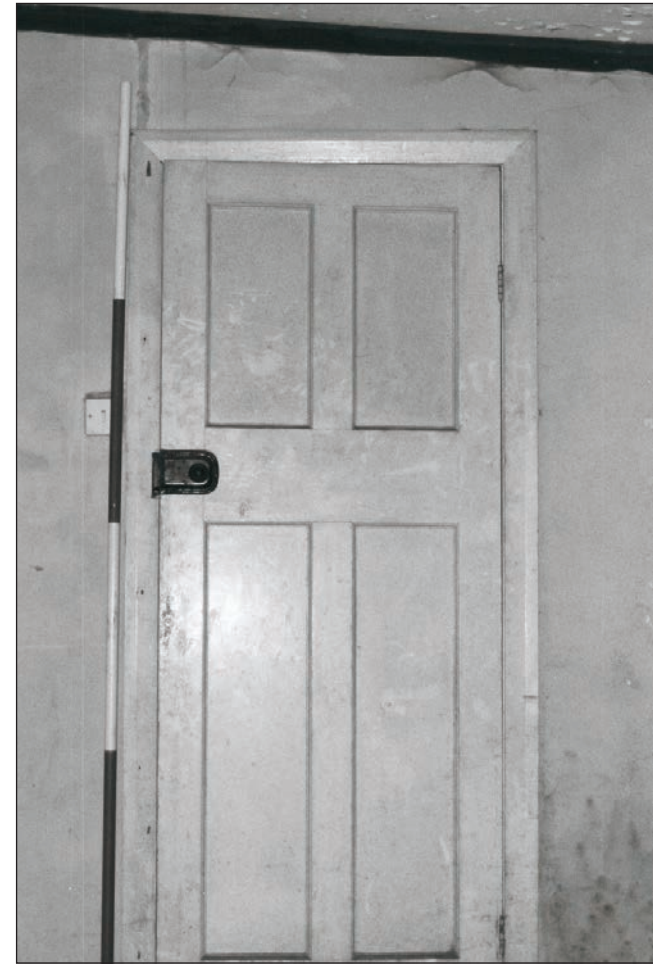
General view of door to G2 from G1, Building 2 (Film 04.13)
